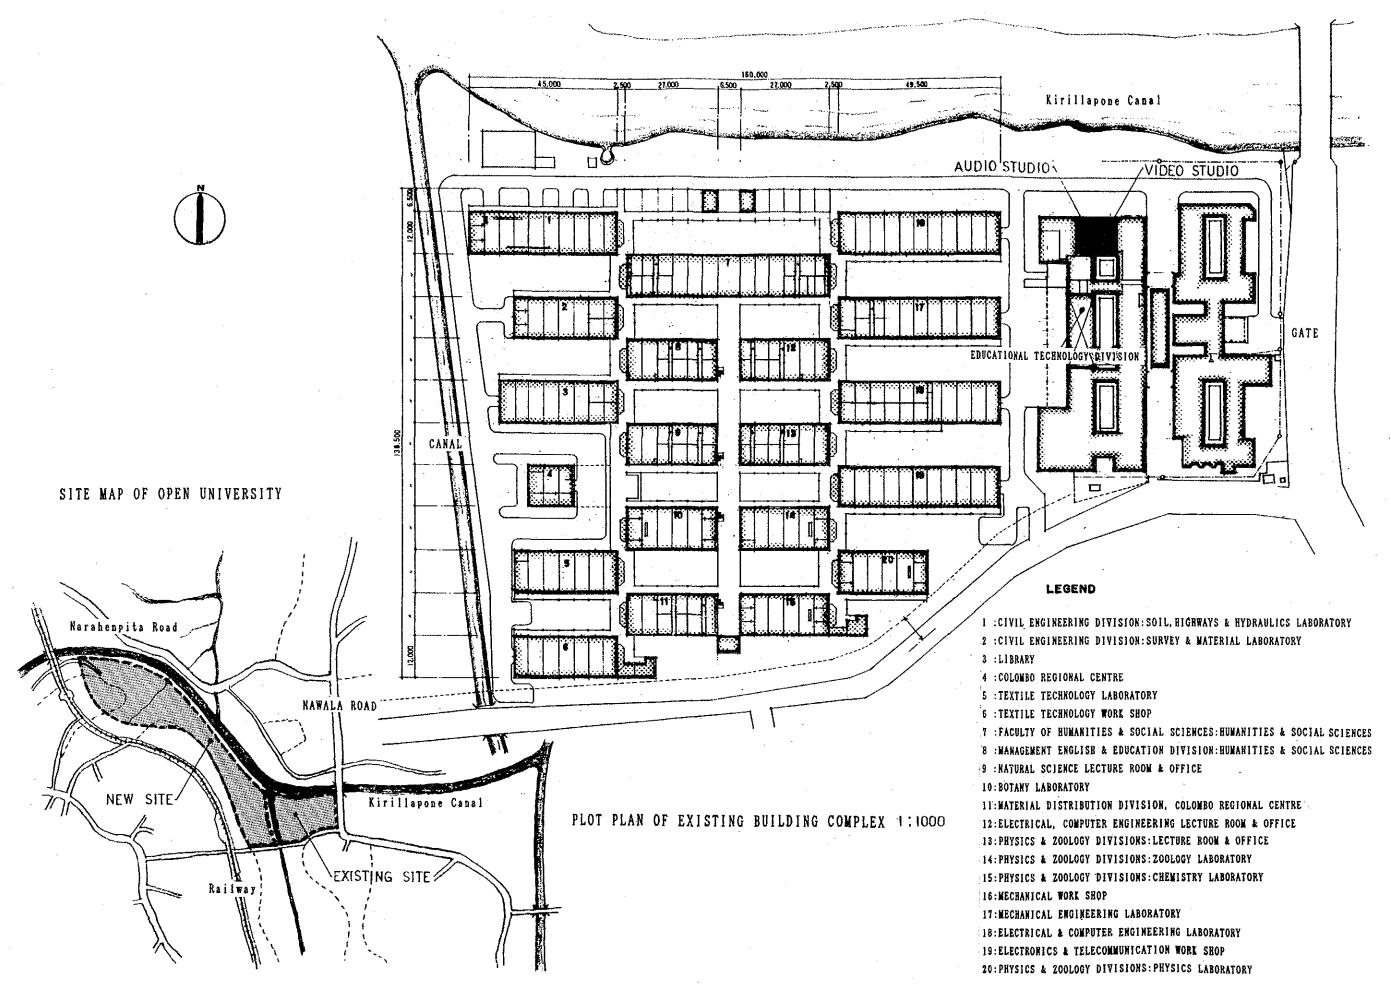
SITE MAP AND PLOT PLAN OF EXISTING BUILDING COMPLEX OF THE AV EDUCATION CENTRE
